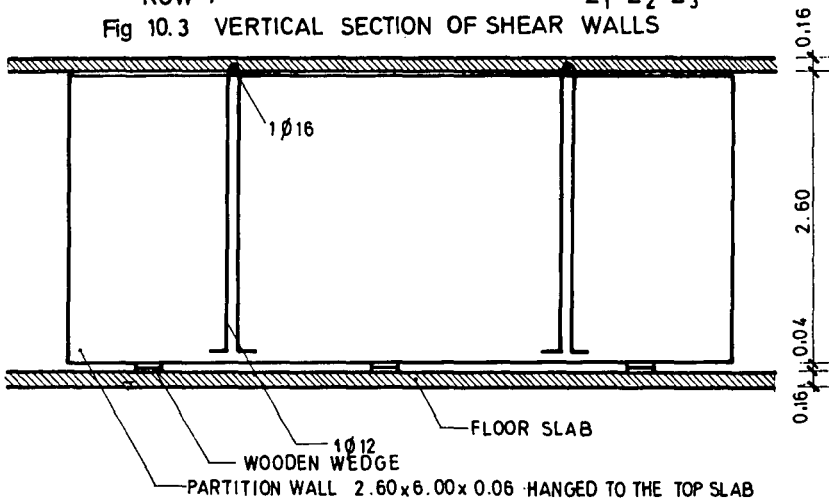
A PARTITION WALL CONNECTION TO THE FLOOR SLAB
